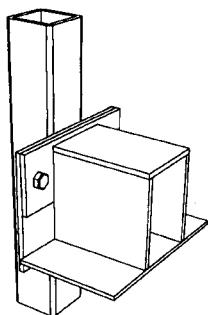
"Welded top hat"-beam support to RHS column
